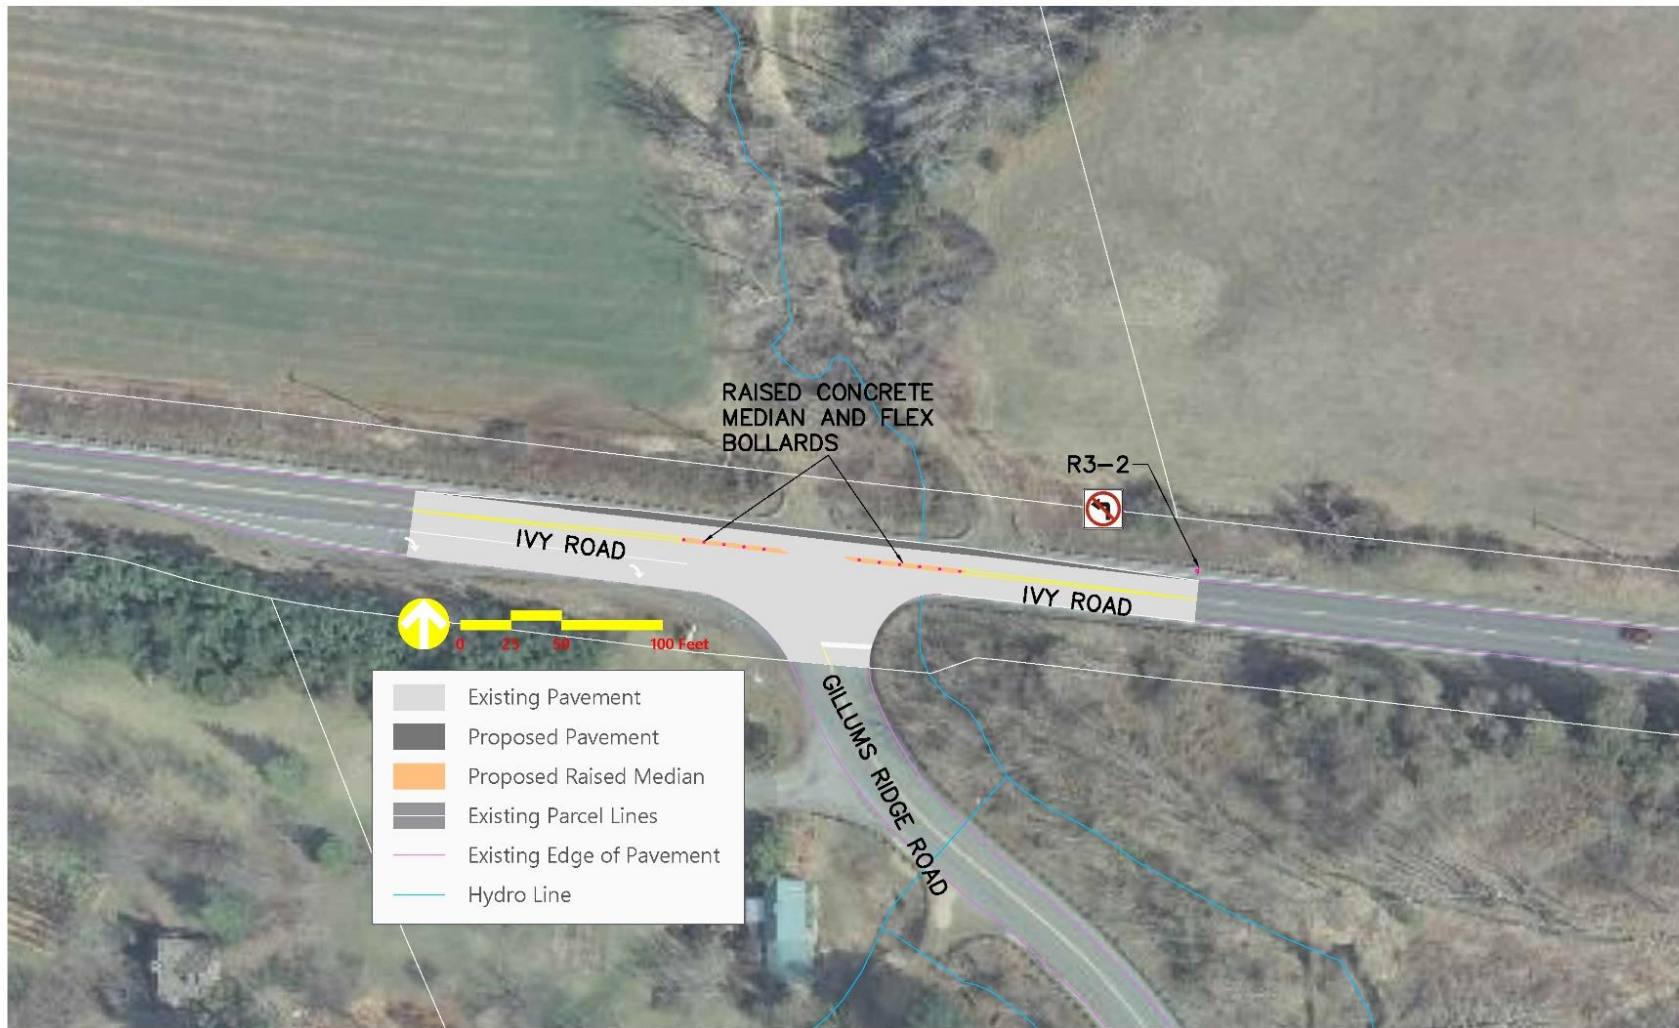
Long-Term Concept B for Ivy Road and Gillums Ridge Road
